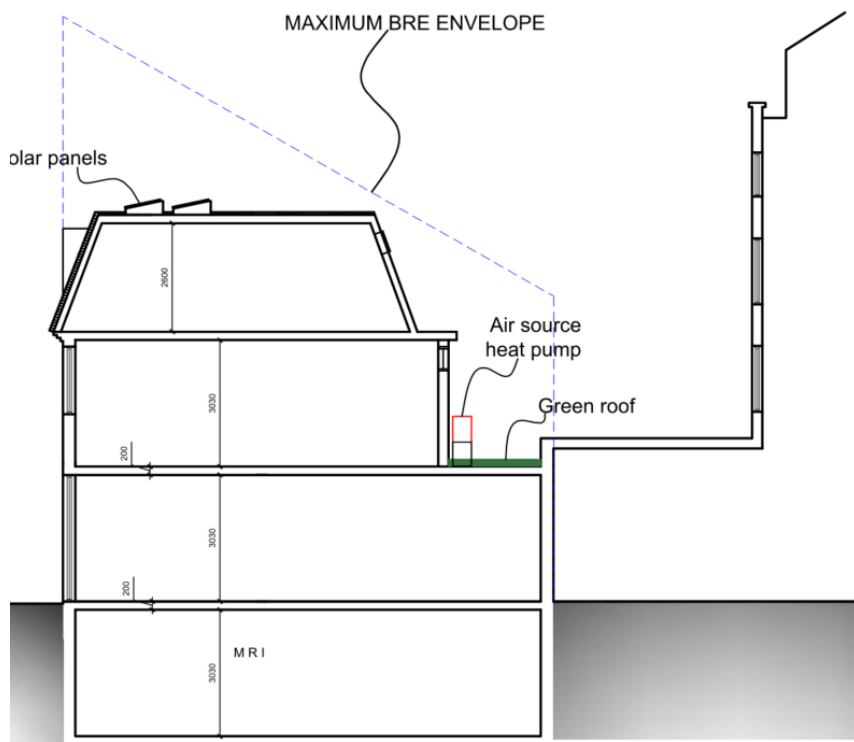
Proposed section, with rear of Warren Street properties on the right.
